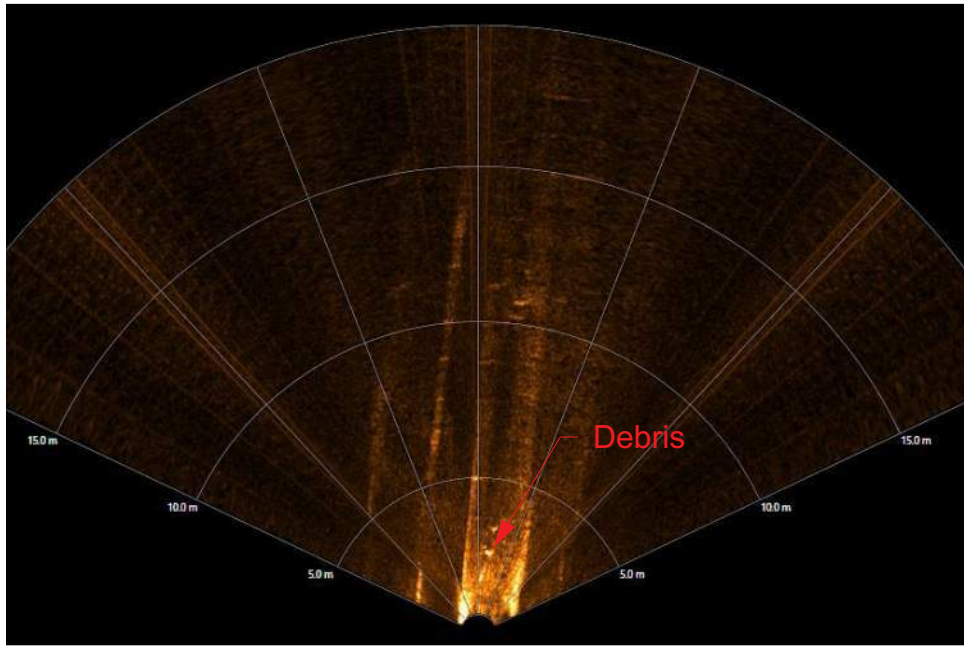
Sonar image at 76 feet downstream of Access Point 1. Debris on invert 6 feet ahead.
